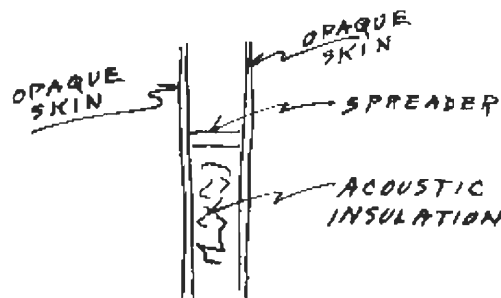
Cross-section of an inside wall. (Roberts, 153)
